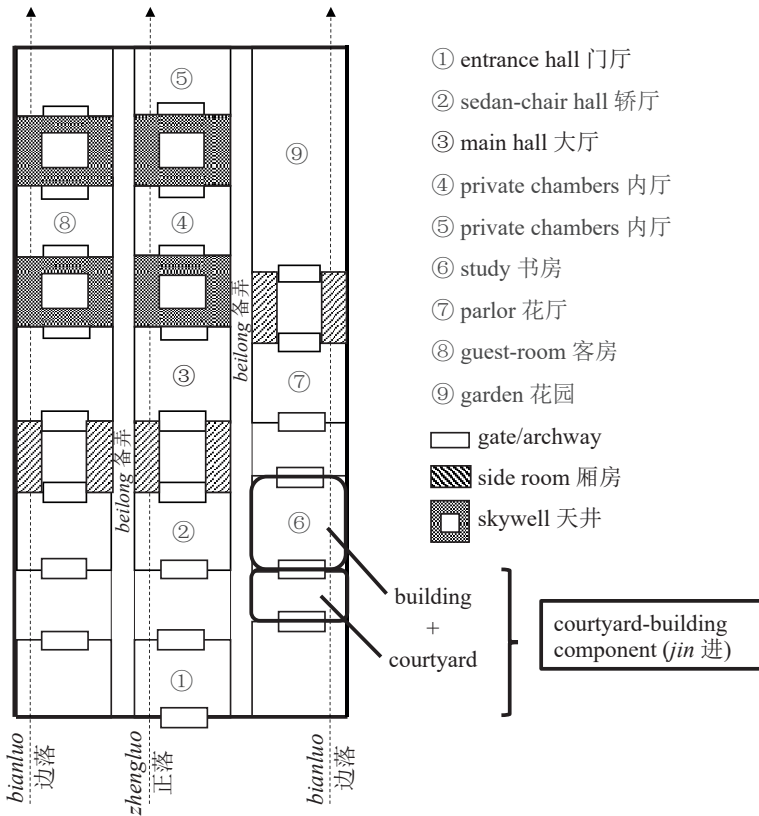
Exemplary Ground-Floor Plan of a Suzhou Mansion.
